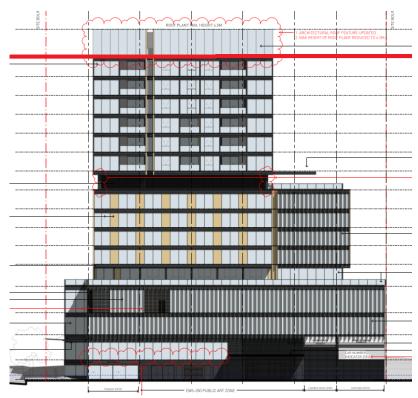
Extract of sectional drawing when viewed from Ashley Lane. Evaluation
